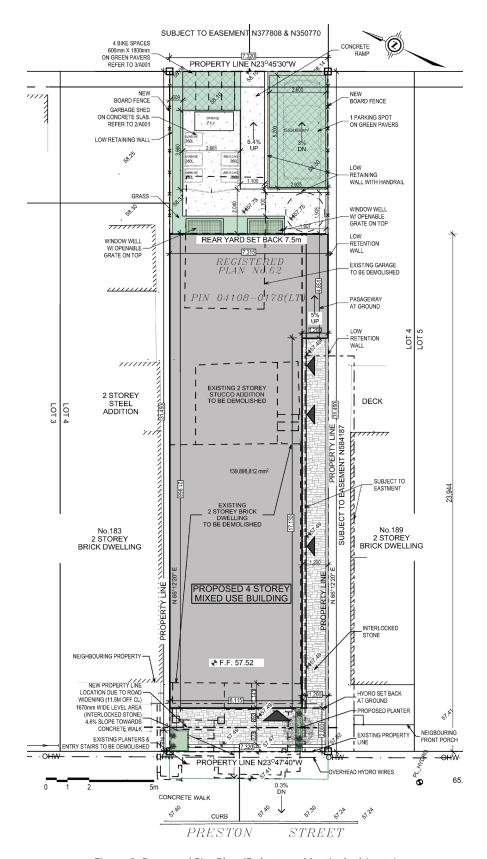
Proposed Site Plan (Robertson Martin Architects)
